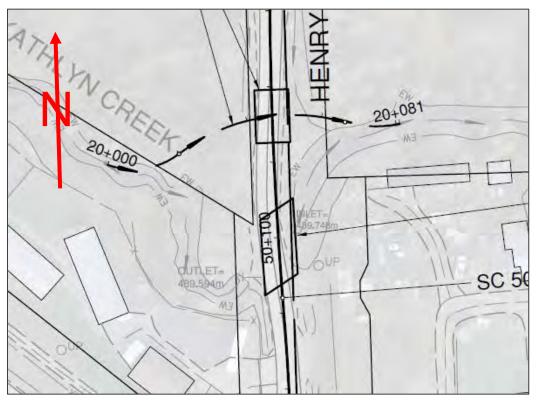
Sketch of Henry Road crossing with potential bridge locations (MoTI Sep 29, 2020)
